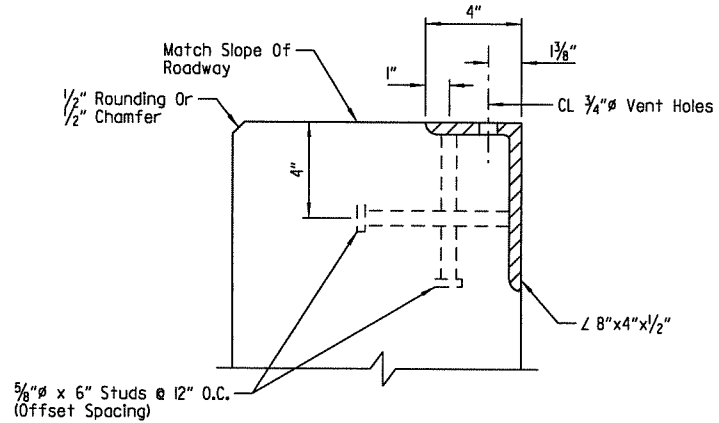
DETAILS FOR BLOCKING EXPANSION JOINT DEVICE
